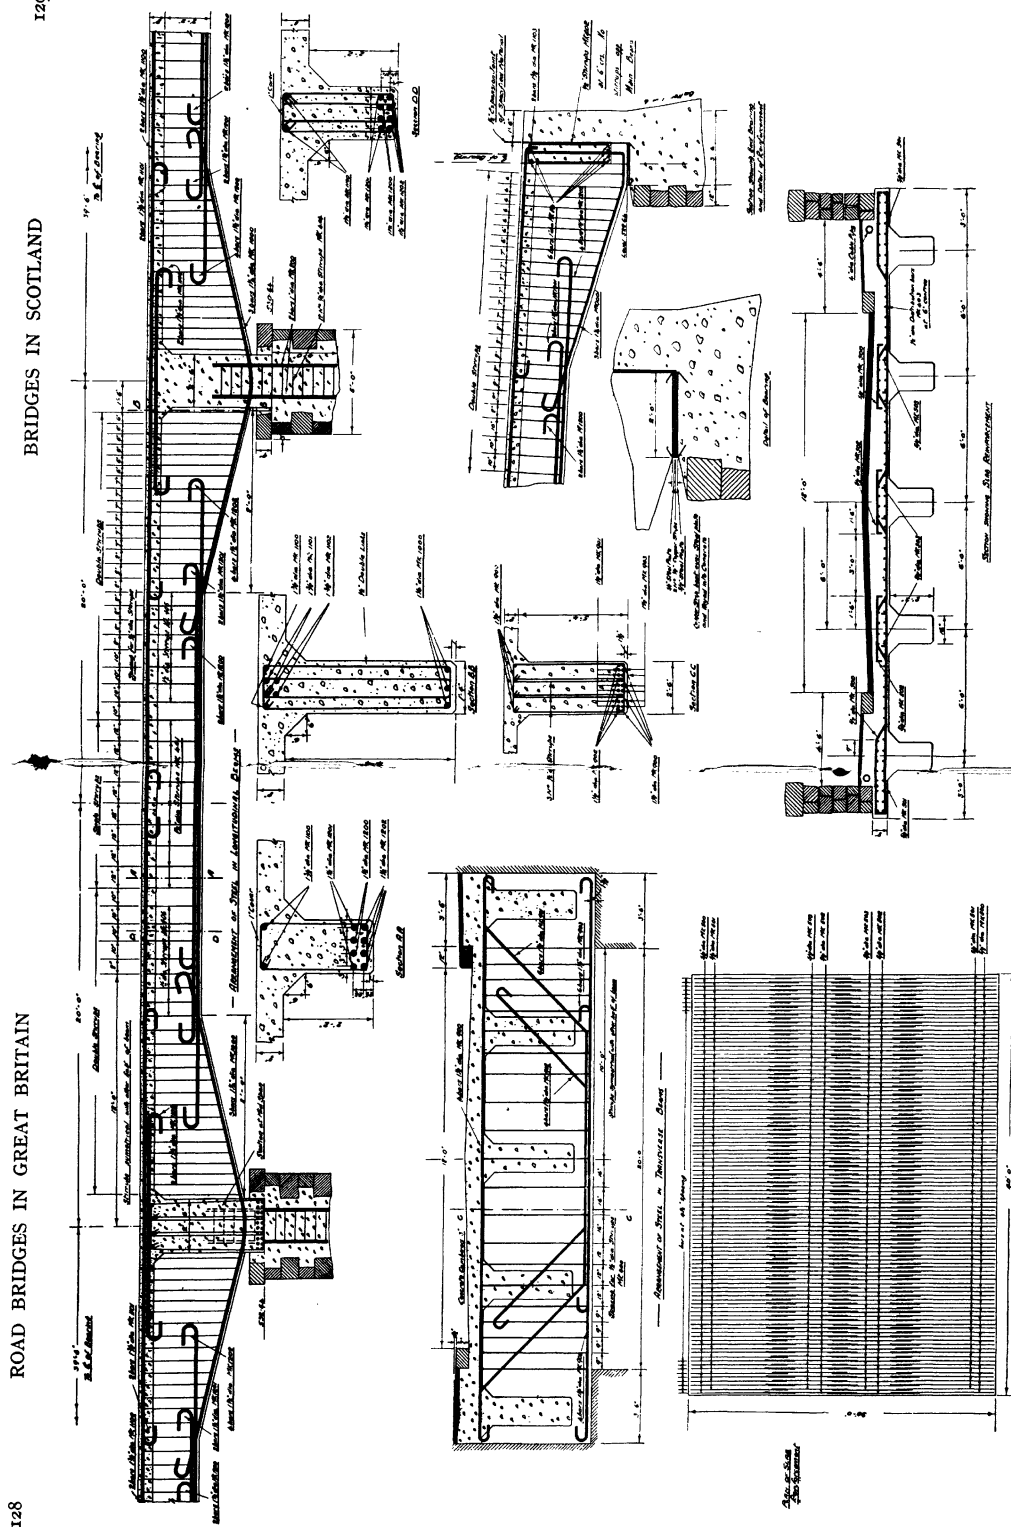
COBBLER BURN BRIDGE: DETAILS OF REINFORCEMENT.
